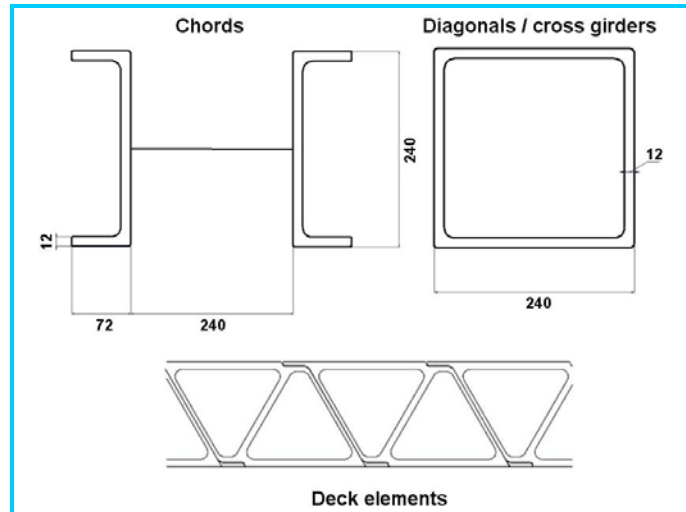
Structural profiles proposed for GFRP lightweight bridge model
